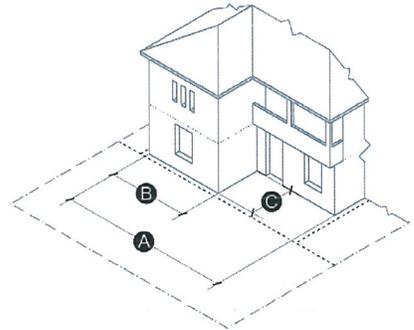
The front yard-facing building plane ‘B’ shall be offset by a dimension of ‘C’ from other front yard-facing building planes and shall not exceed 50% of ‘A’, the Maximum Potential Facade at the front setback line.
